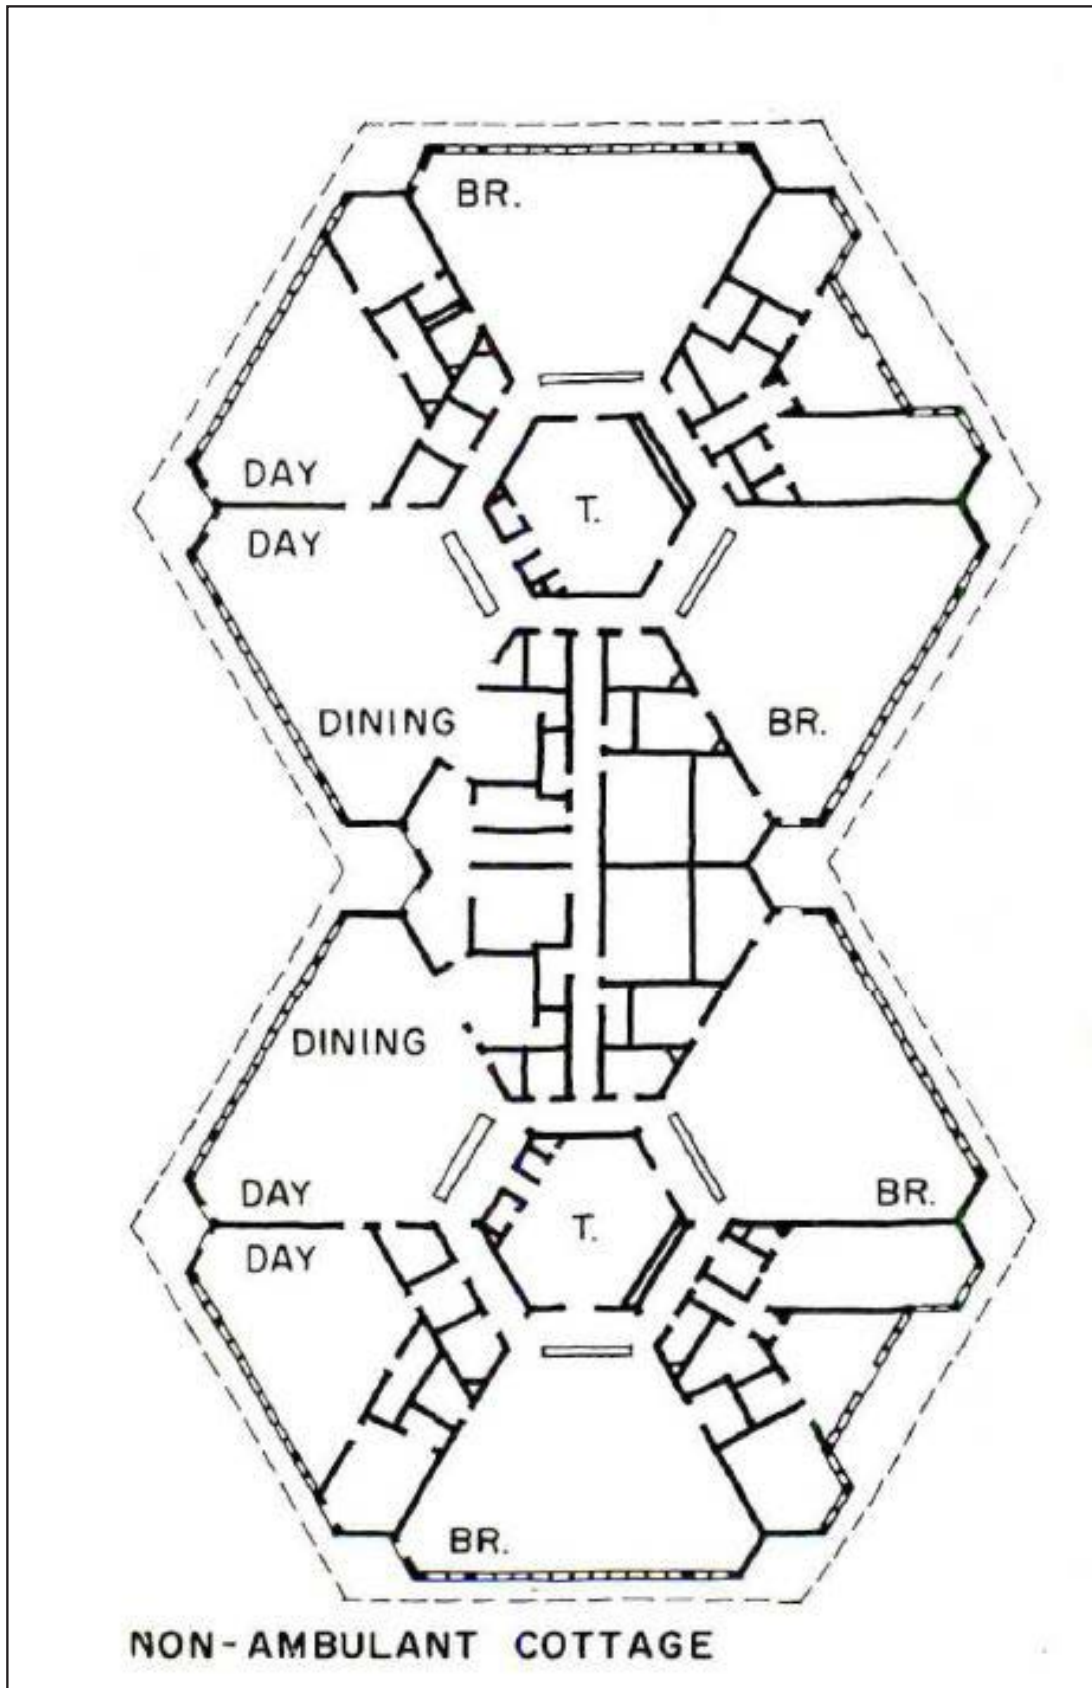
Floorplan of a non-ambulant cottage (Architectural Record 1967:150).
